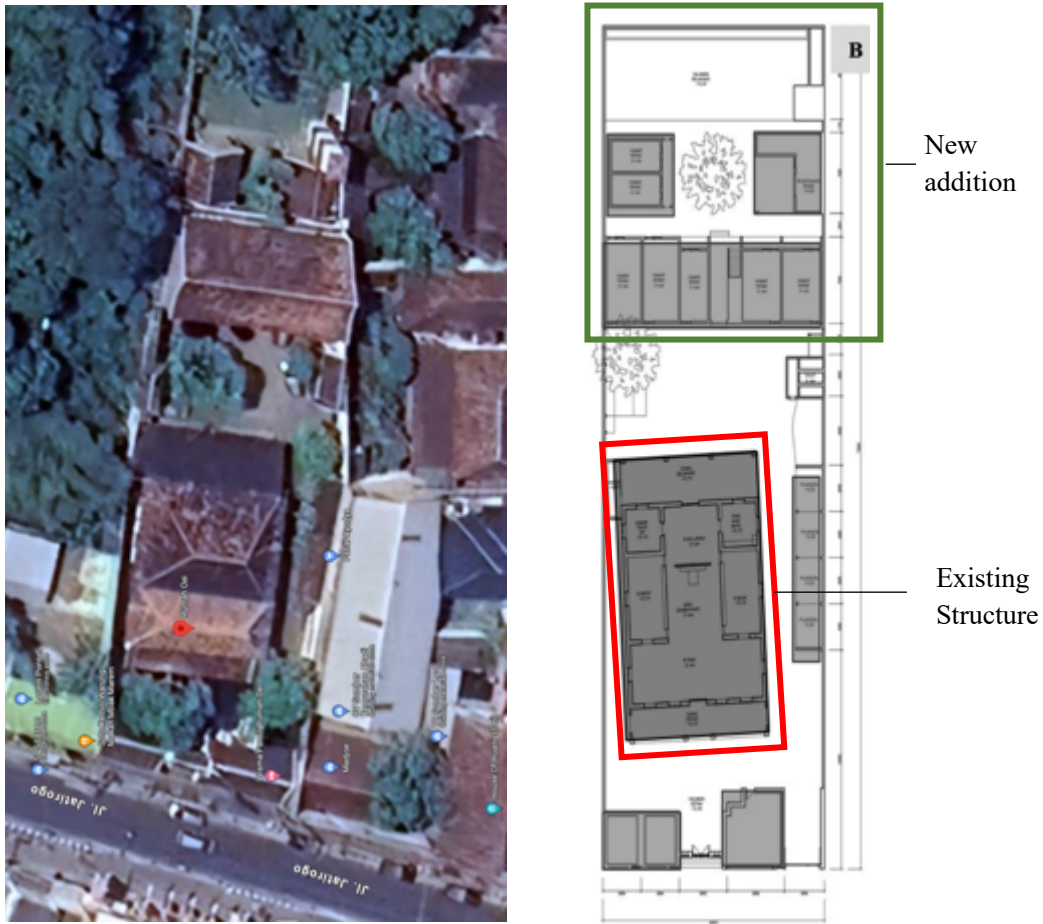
Site Plan of The House of Oei (Left) (Source: google maps) & Figure 4.4. Ground Floor Plan of the House of Oei (Right) (Source: Kwanda, T. 2020)
